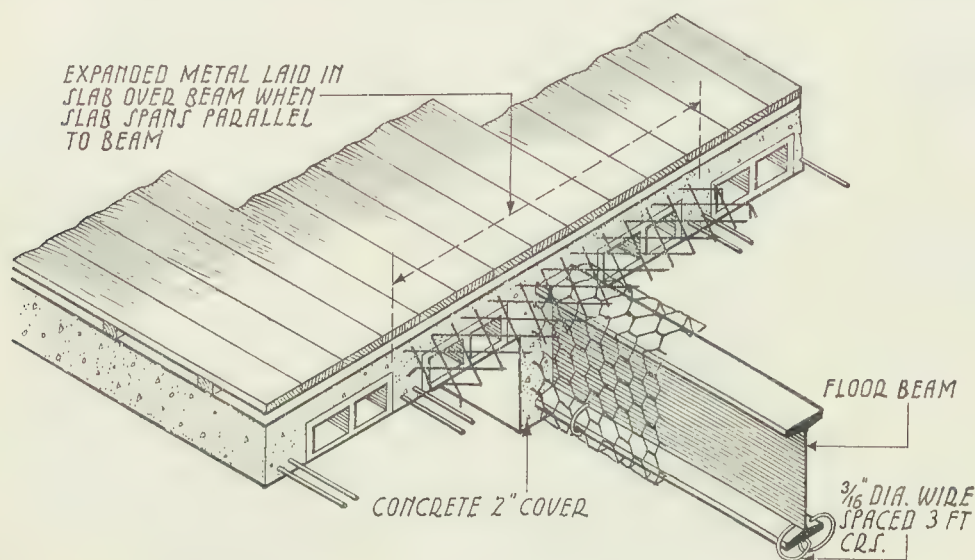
REINFORCEMENT PLACED OVER FLOOR BEAMS
